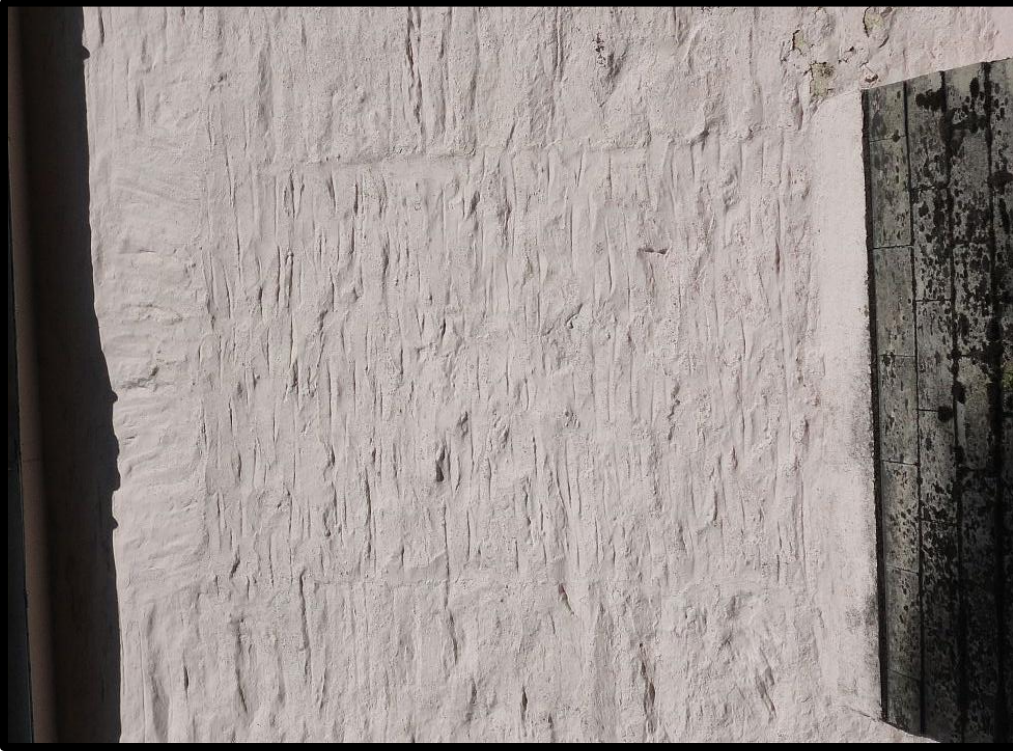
Detail of the blocked ?loading door in the south wall of the cottage above the porch.
